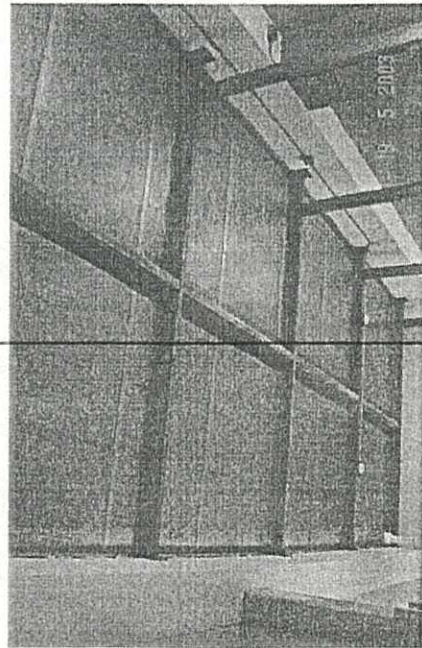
Noise Acoustic Panel Installed on Ceiling in TIS Chiller Plant Room
